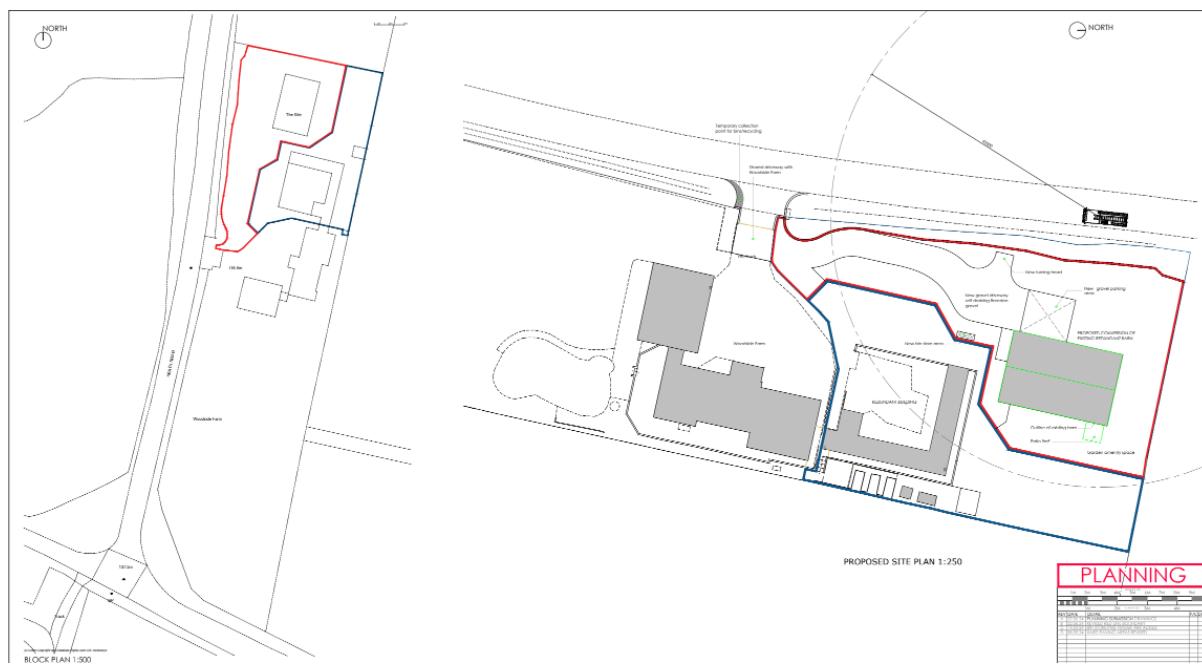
The existing site layout, to the left of the figure, and the proposed plans, to the right, courtesy of The Art of Building Ltd.
